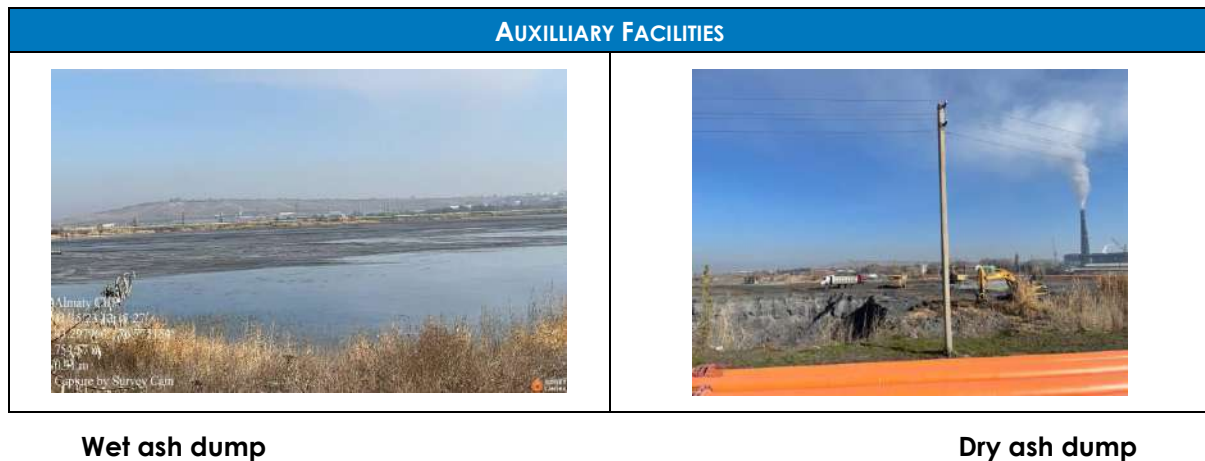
CHP-2 Overview (Auxiliary Facilities)
